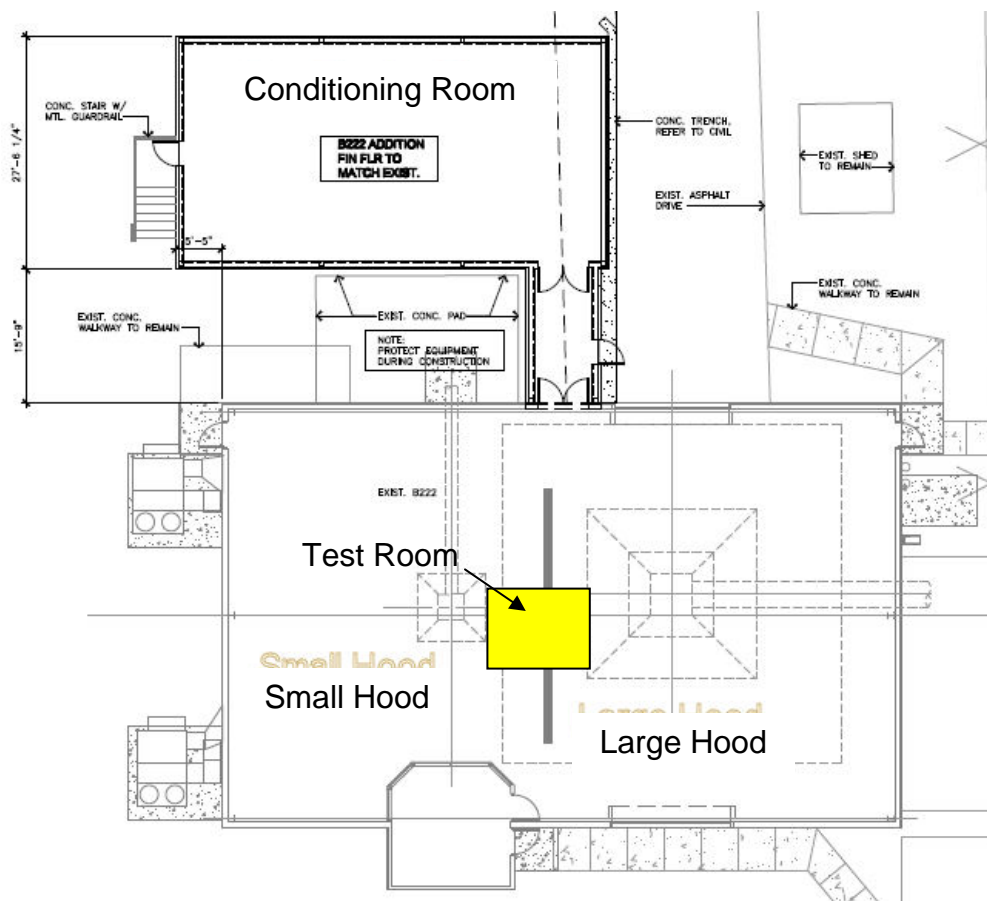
Plan View of SwRI Calorimeter Building and Conditioning Room.
